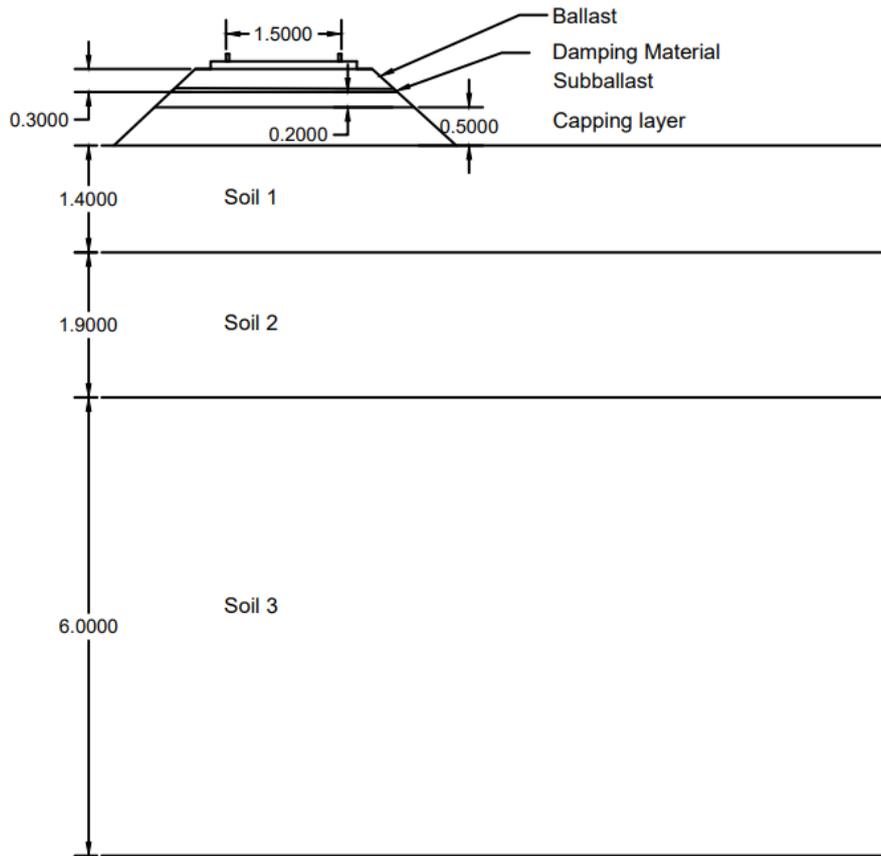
The Thalys HST Railway Track (Track Geometry and Soil Profile).
